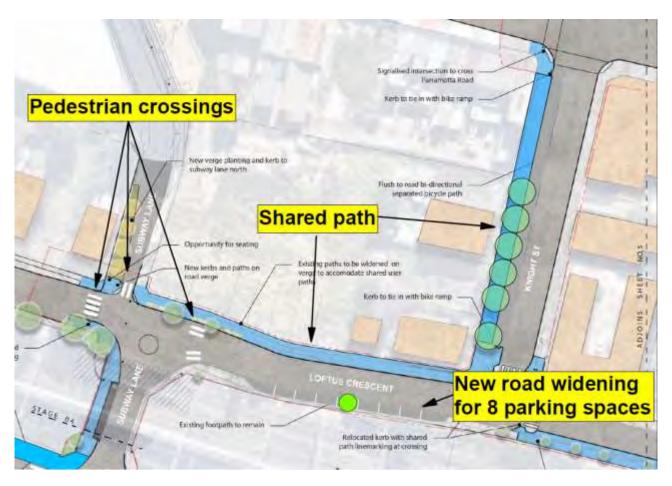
Section 4 of the HMaPP between Subway Lane and Parramatta Road
